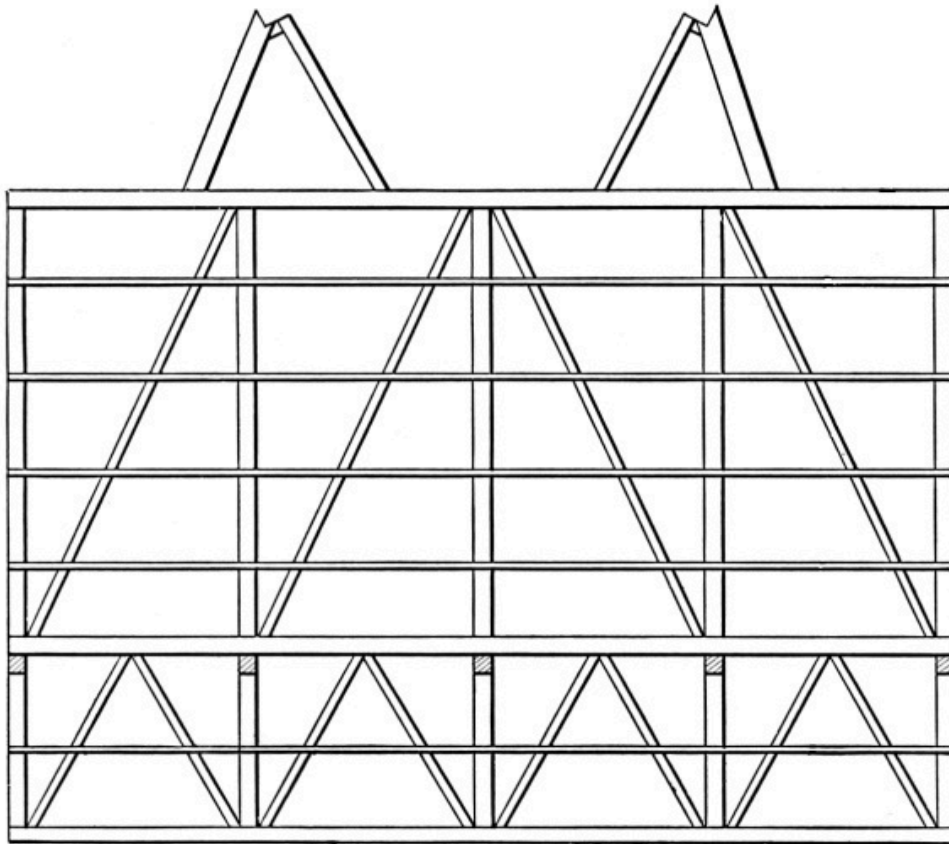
Outside View of End Bent of Superstructure and Basement Bents.—Scale, 3-32 Inch to the Foot.
